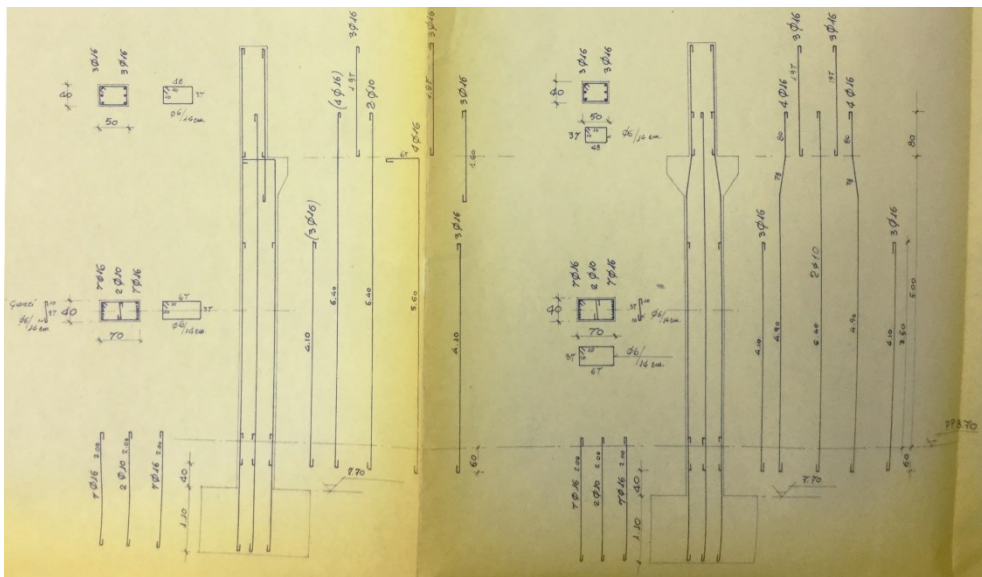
Longitudinal rebars and stirrups of columns of the case study.
